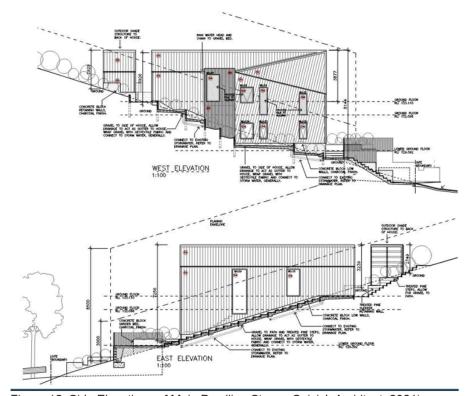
Side Elevations of Main Dwelling Steven Spizick Architect, 2021)
